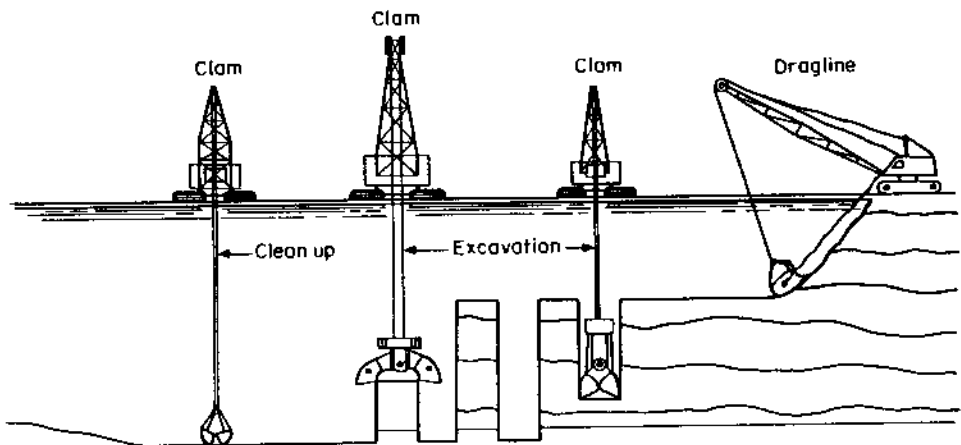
Slurry trench excavation by dragline and clamshell (Xanthakos 1979).
